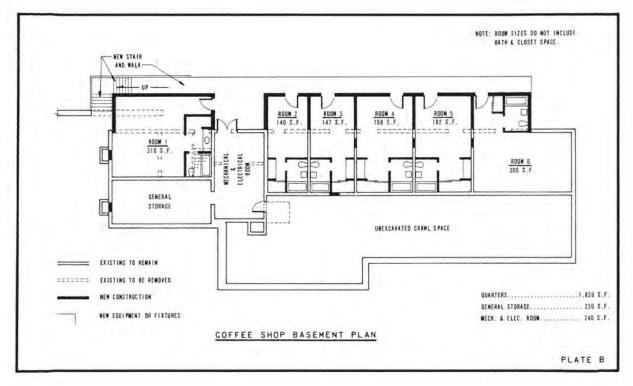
Proposed redesign of basement of the coffee shop as outlined by the 1980 study; filled walls represent new construction; north is oriented toward the top of the page. Seven guest rooms with bathrooms are created at the basement level by extending the building footprint to the north and eliminating the interior stair and western rooms. A new walkway would allow all guest rooms to be accessed from the exterior. (Lee Wan and Associates, Inc. "Bluffs Lodge and Coffee Shop Renovation Study", , February 1980, BLRI Coll., ETIC)
